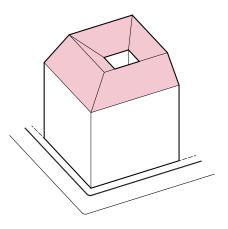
Stutzflügelhaus schema built between 1860-1918 S 1:1000
